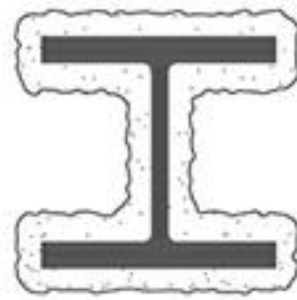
Lath-and-plaster fireproofing around a steel beam.
